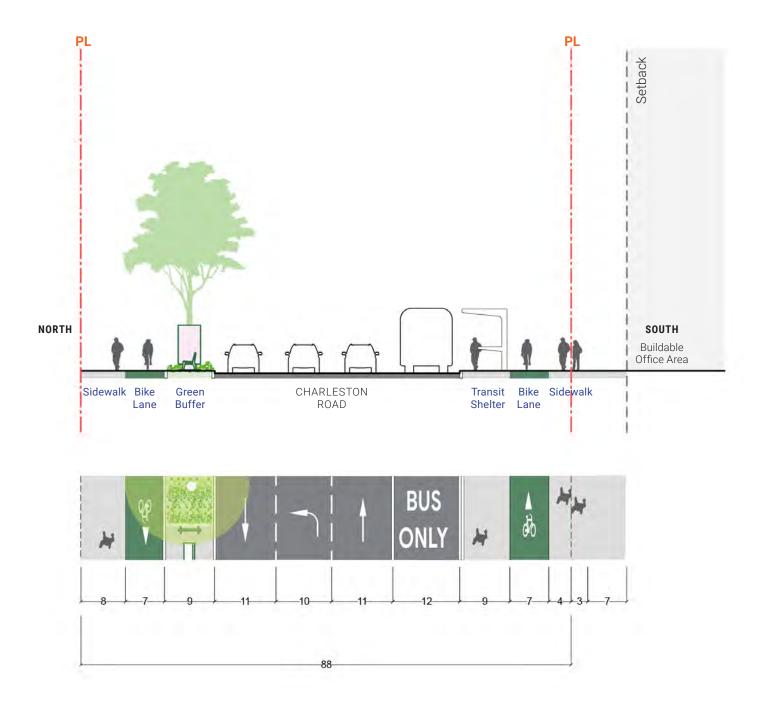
CHARLESTON ROAD SECTION 04 (WEST OF INIGO)
